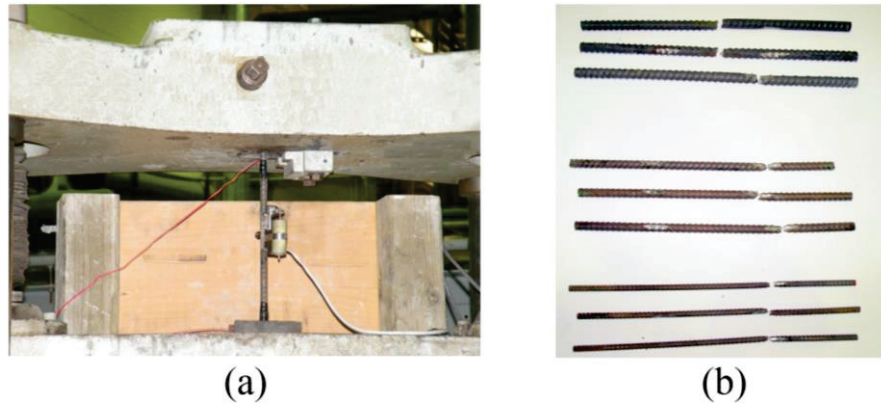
Tension test for steel reinforcement bars: (a) test setup; (b) modes of failure
